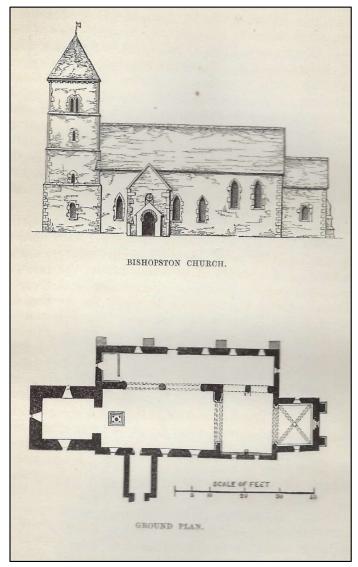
Figg's plan & south elevation of Bishopstone Church 1849
